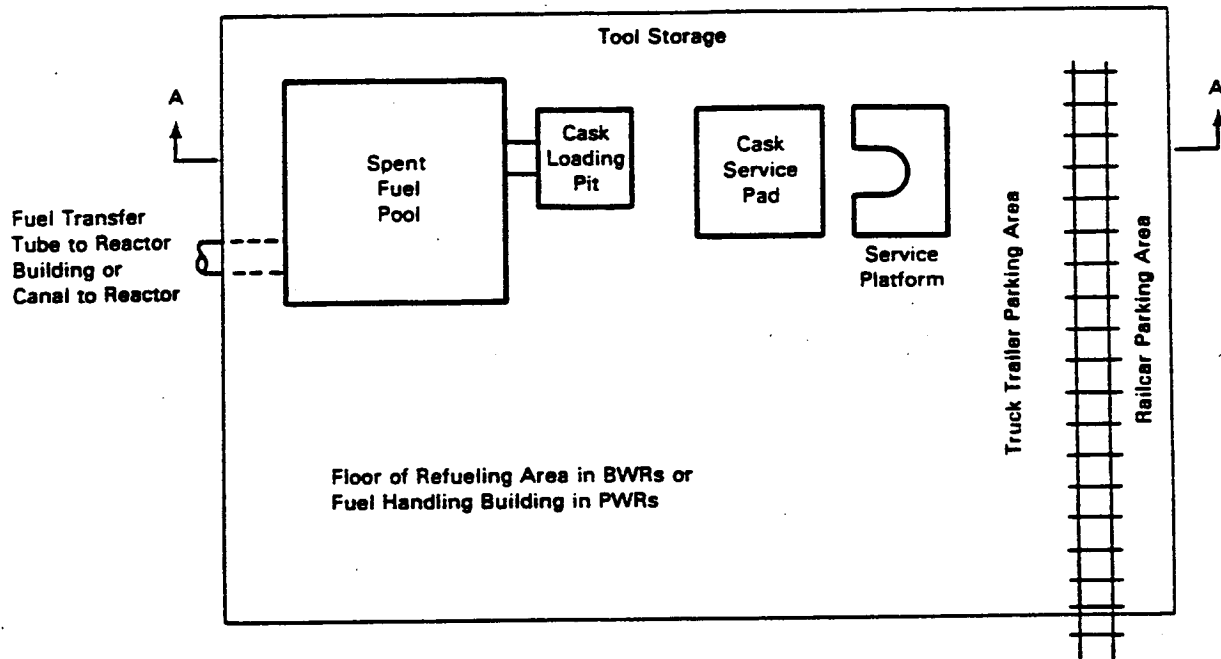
Plan View of Postulated Reference Cask Handling Facilities at Reactor Plants
